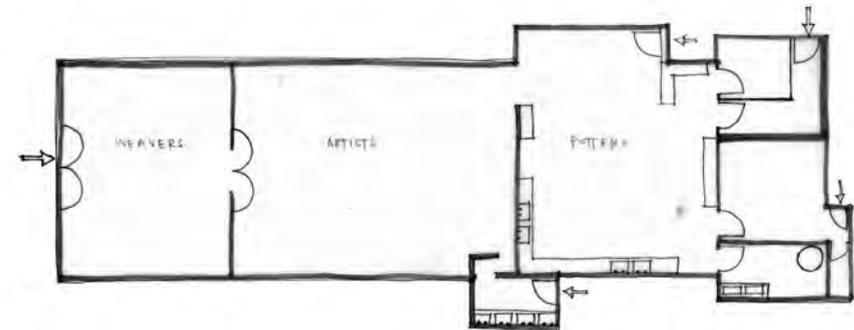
Diagrammatic floor plan of the existing Taupo Active Arts Center building
